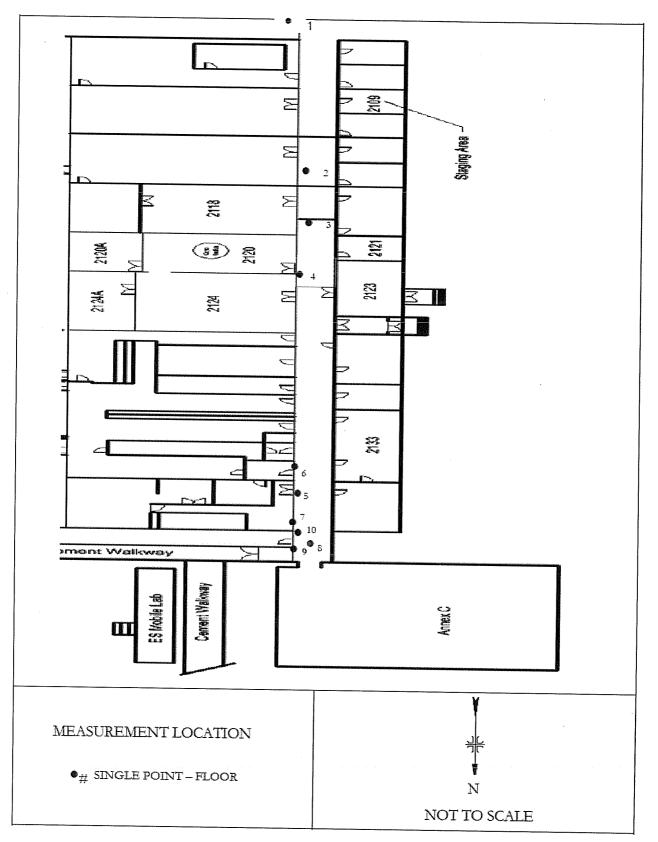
Building 1, Hallway – Direct Measurement Locations
